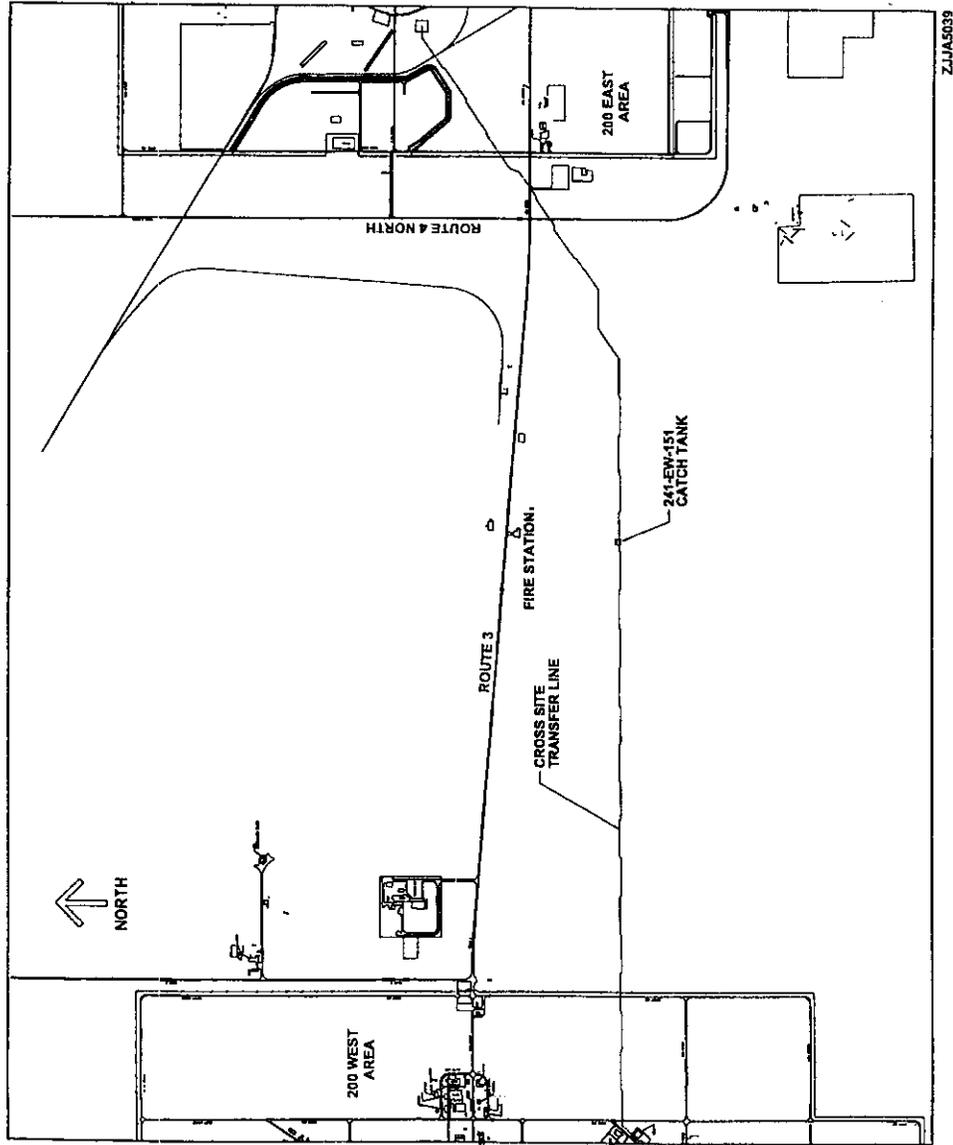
SITE PLAN – 241-EW-151 Catch Tank.
